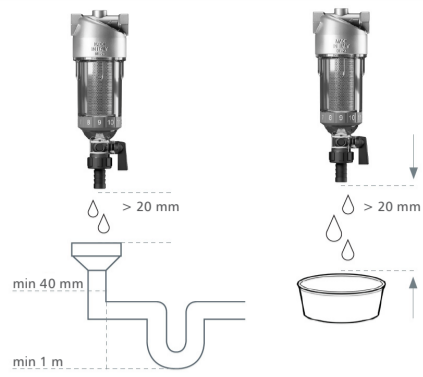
Location of the drain to the sewerage system or the container collecting water from the filter.
